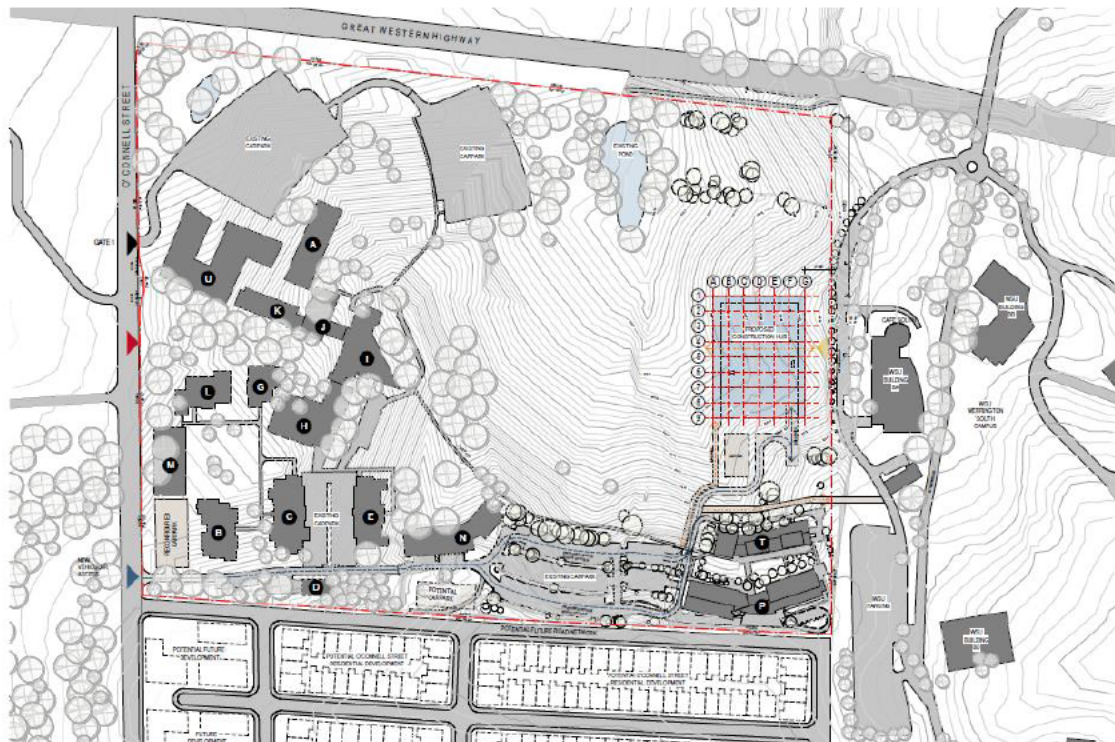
Proposed site plan showing location of works to the eastern portion of the site.
